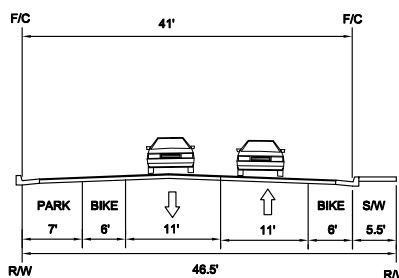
Jibboom Street Between Camille Lane and Railyards Blvd. (looking north)
